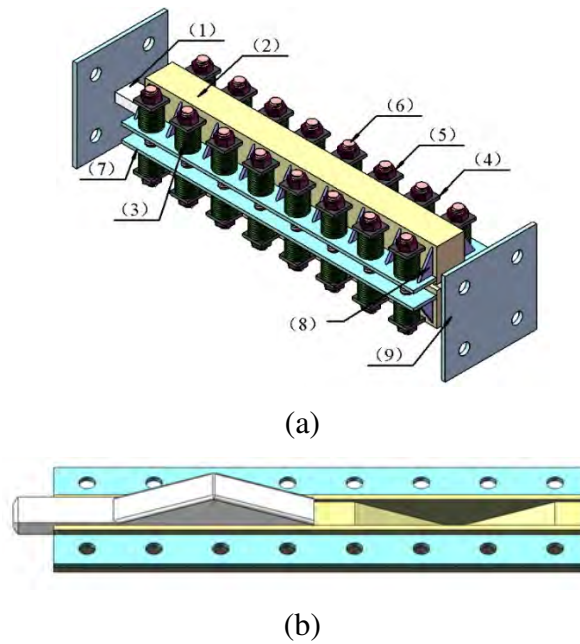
(a) 3D sketch of the brace, and (b) outer sleeve and inner core.
